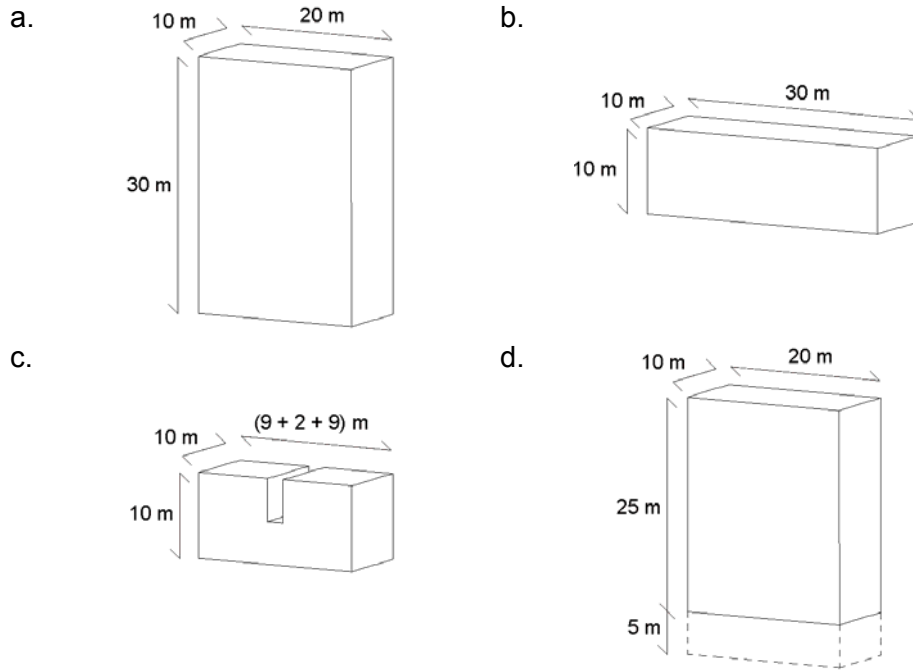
Building typologies analyzed in this paper: (a) tall building, (b) low long building, (c) low long building with central opening, (d) tall building with underpass.
